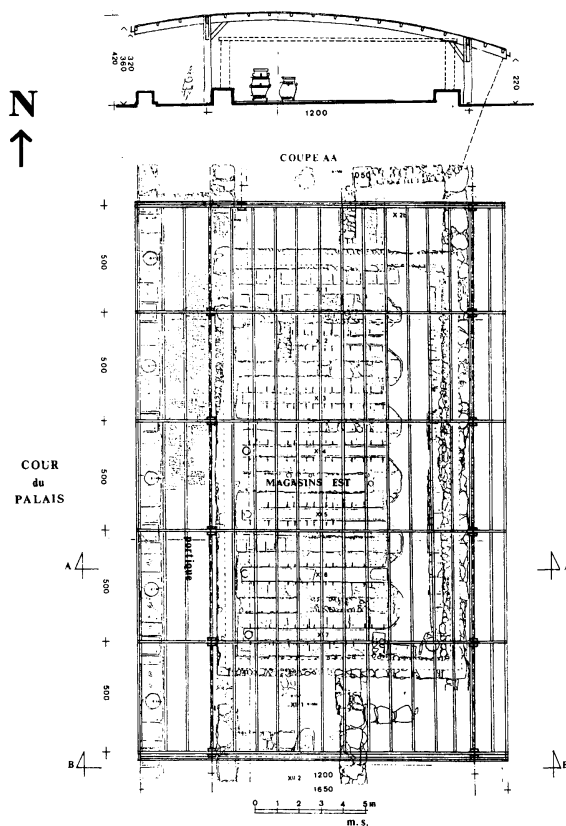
Mallia: section (above) and plan (below) of the shelter covering the east magazines of the Palace.
